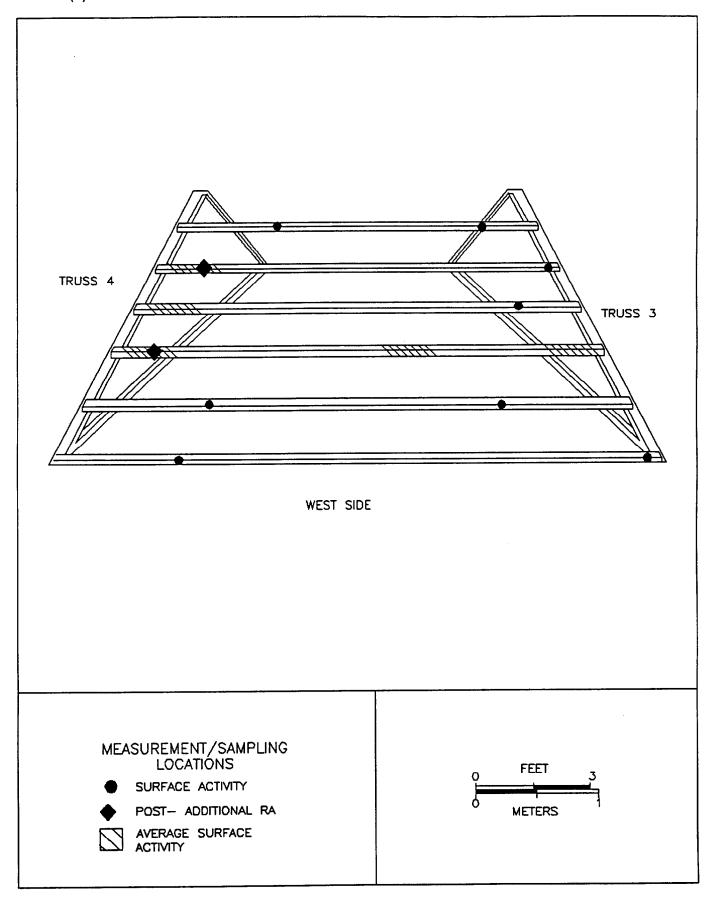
Building 3, Bay 3, West — Measurement and Sampling Locations
